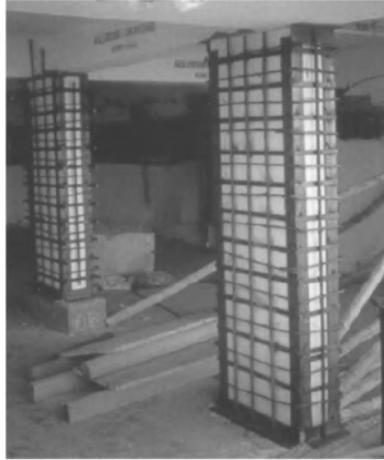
Jacketing of RC columns with steel angle sections and steel straps after the 2001 Bhuj, India earthquake (Photo: Jain et al., 2002).
